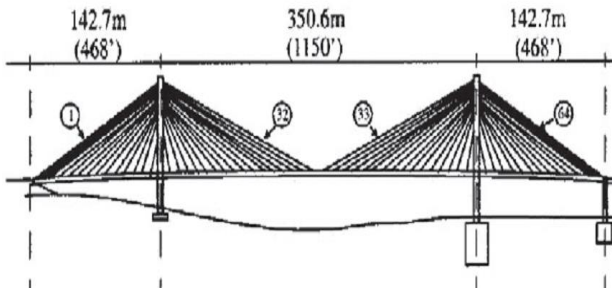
Cable-stayed bridge geometry dimensions [4]
